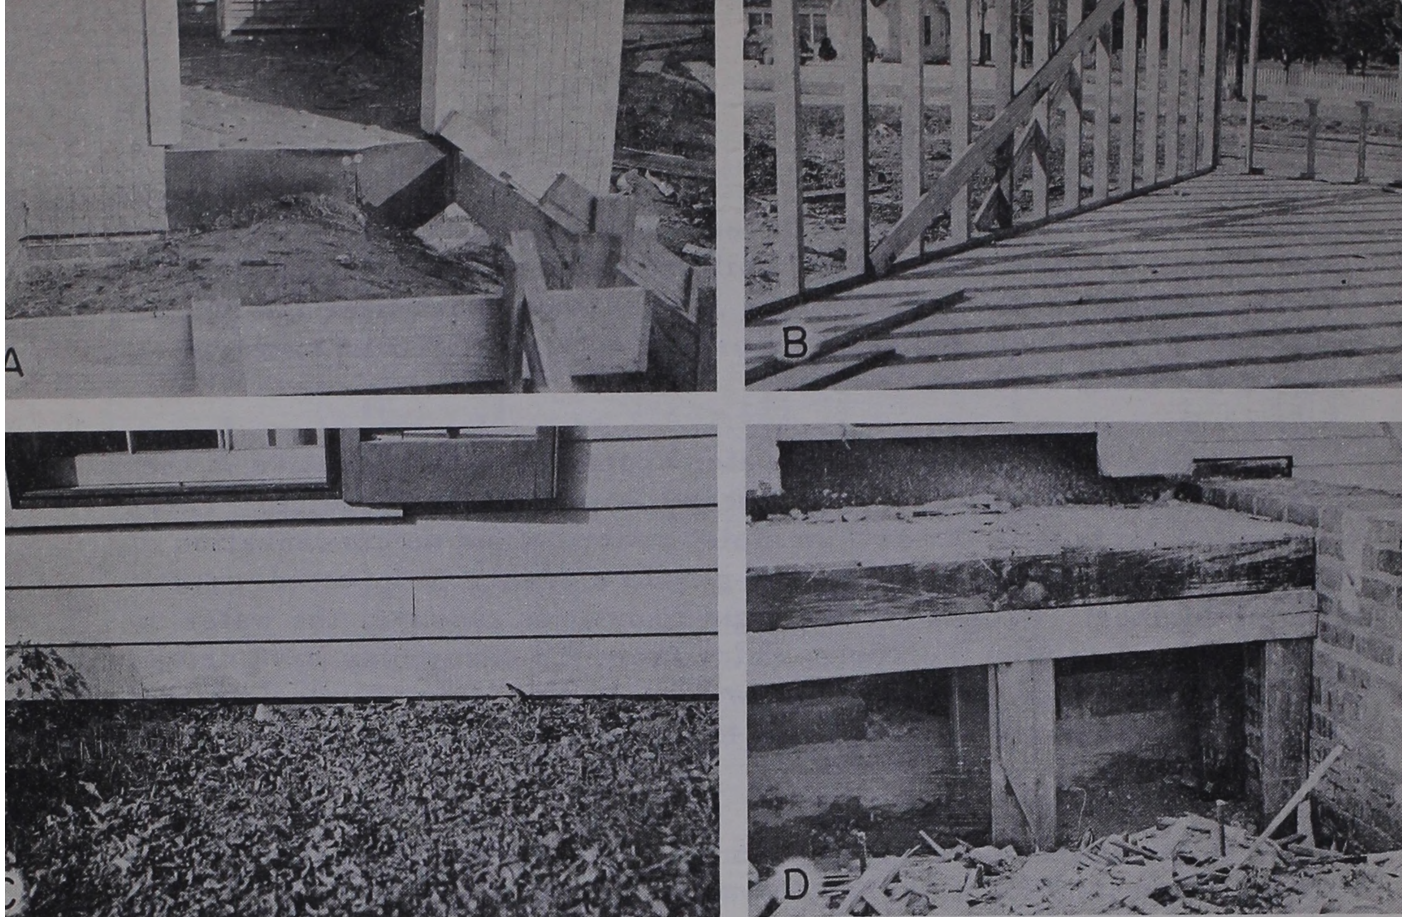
Some common practices leading to attack by water-conducting fungi. A, The dirt fill for this porch is separated from the untreated sill only by sheathing paper. B, Non-waterproofed groundline concrete slab. C, Untreated wood in contact with soil. D, If these forms are left after the stoop slab is poured, they will make a wooden contact between the soil and the sill of the house.
